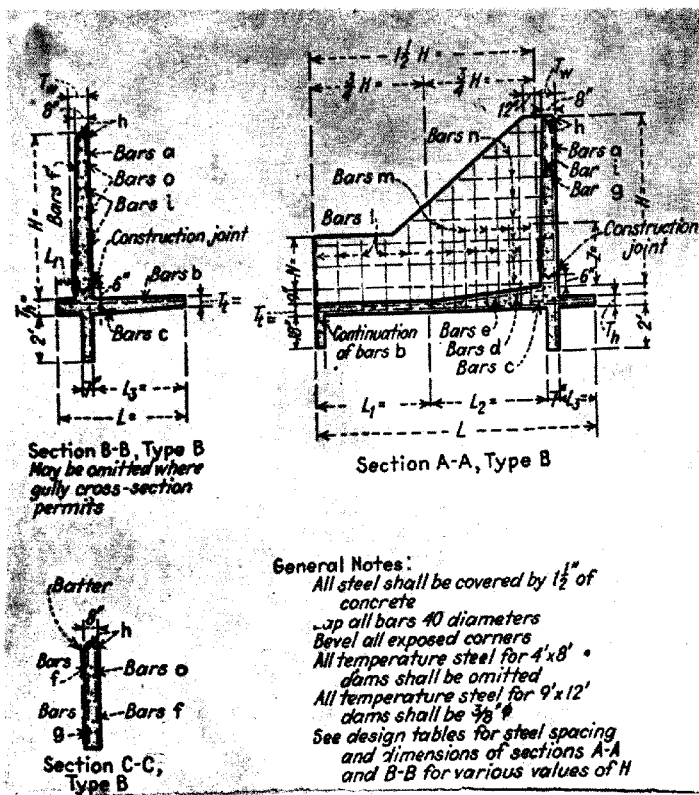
REINFORCED CONCRETE WEIR NOTCH DAM
